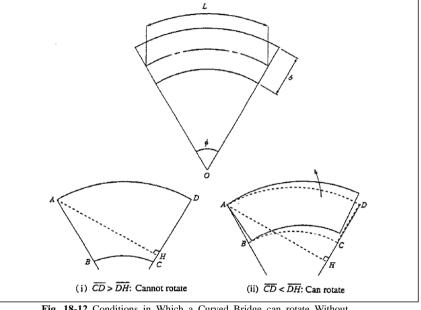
Conditions in Which a Curved Bridge can rotate Without being Affected by Adjoining Girders or Abutment
